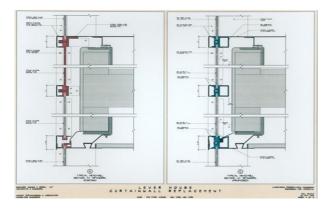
Curtain wall Details, Lever House. ©Skidmore, Owings and Merrill Source: SOM.com
